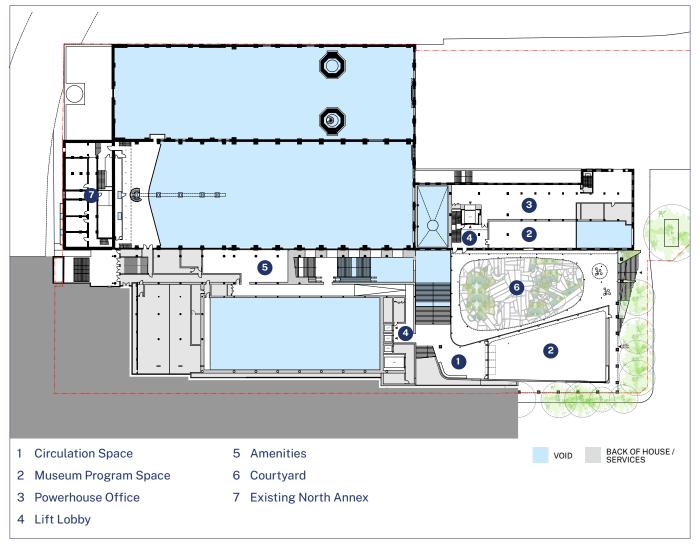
Architectural drawing of proposed first floor of the Powerhouse Museum Ultimo Revitalisation (source: Durbach Block Jaggers & Architectus)
